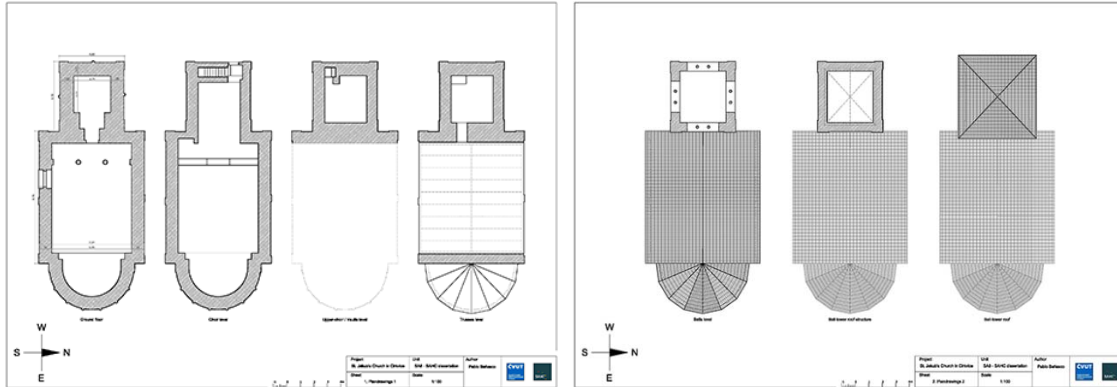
Plan drawings. Pablo Bañasco, 2018.
